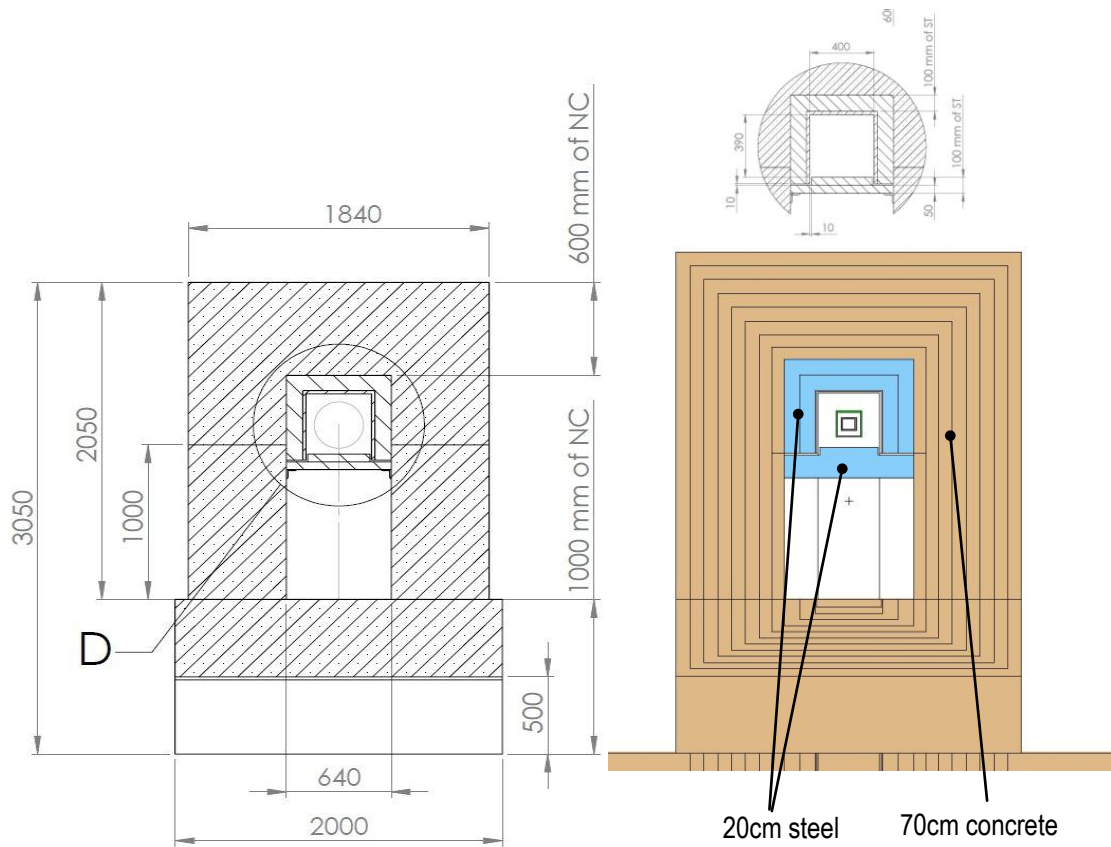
Vertical cut through the guide shielding. Left hand side: Technical drawing. Right hand side: Monte Carlo model (in the Monte Carlo model the shielding thickness is higher as in the drawing)
